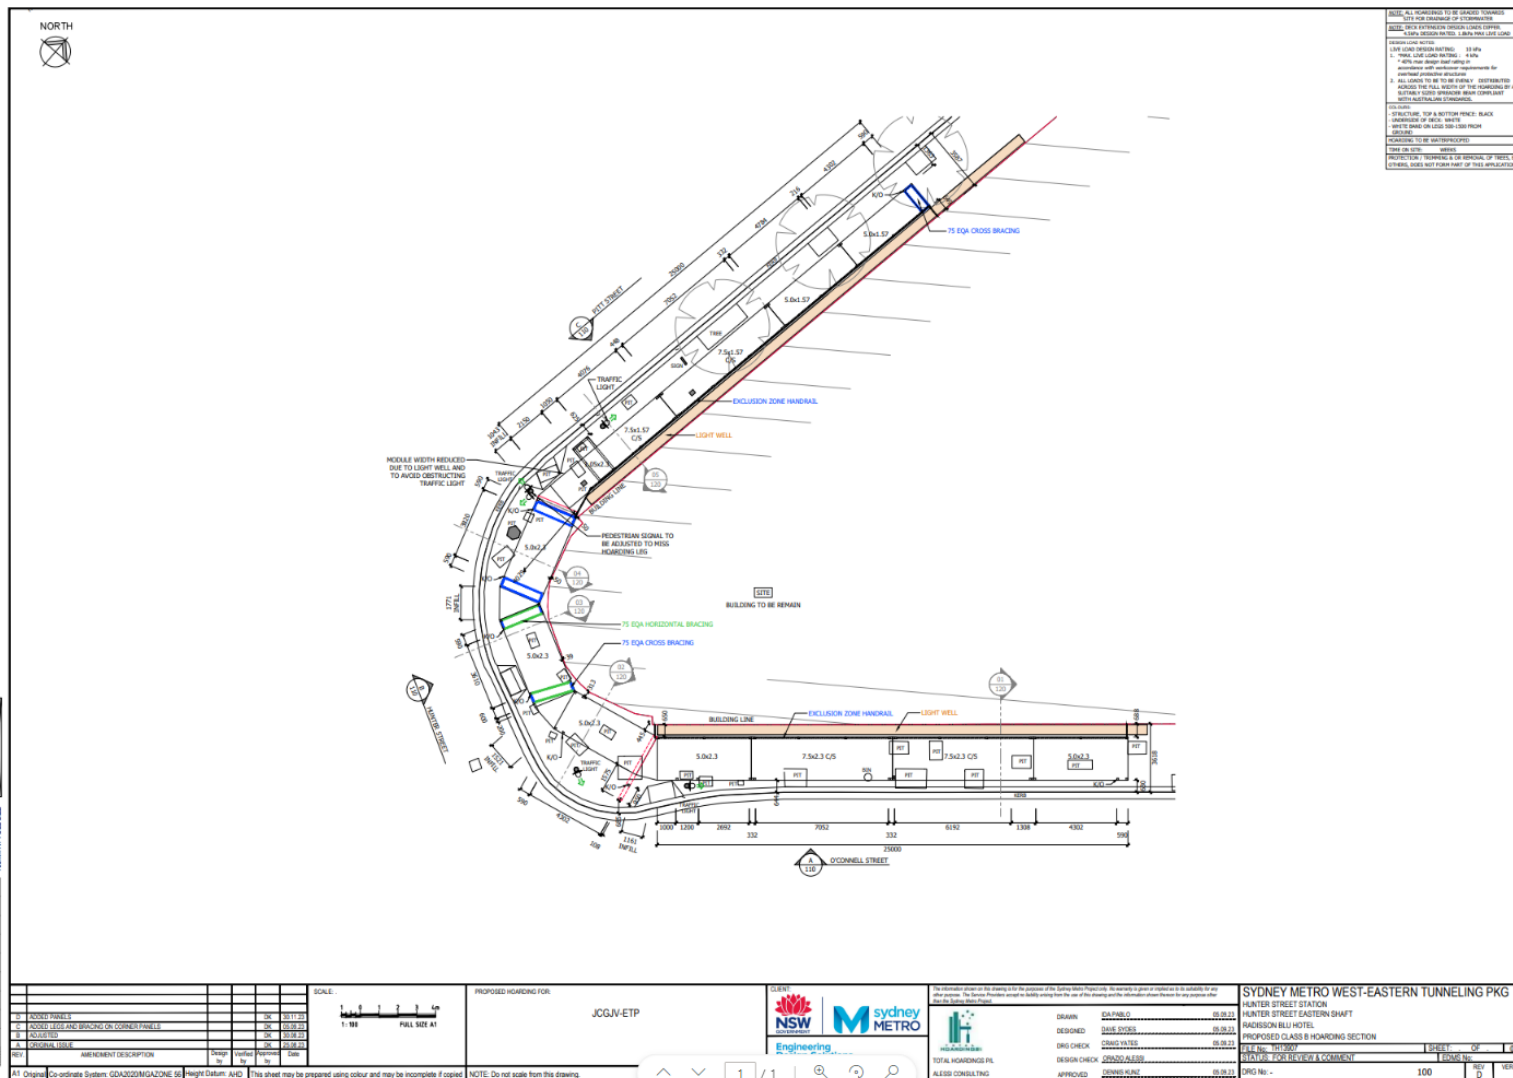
Proposed Class B Hoarding Section Radisson Blu Hotel
